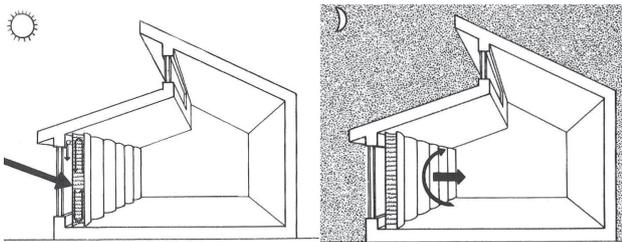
Working principle of water walls (Alparslan, 2010)
